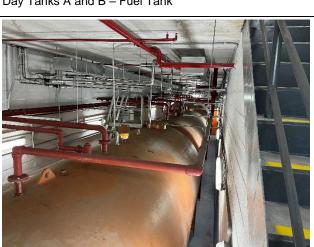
Level P2, Tank Room - 3 Fuel Tanks
